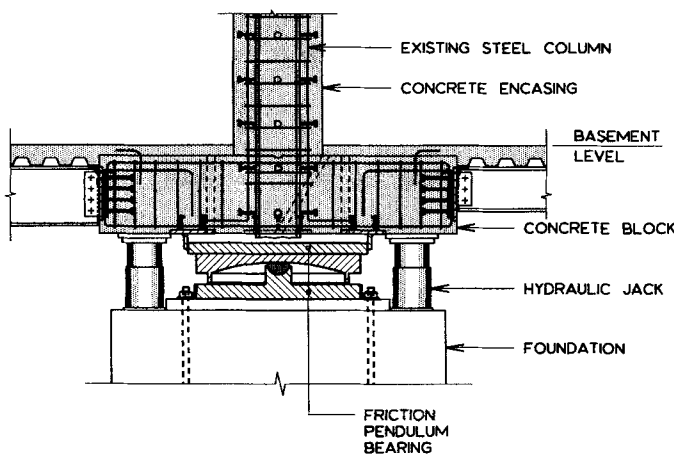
Installation Details of FPS Bearing under Interior Columns
